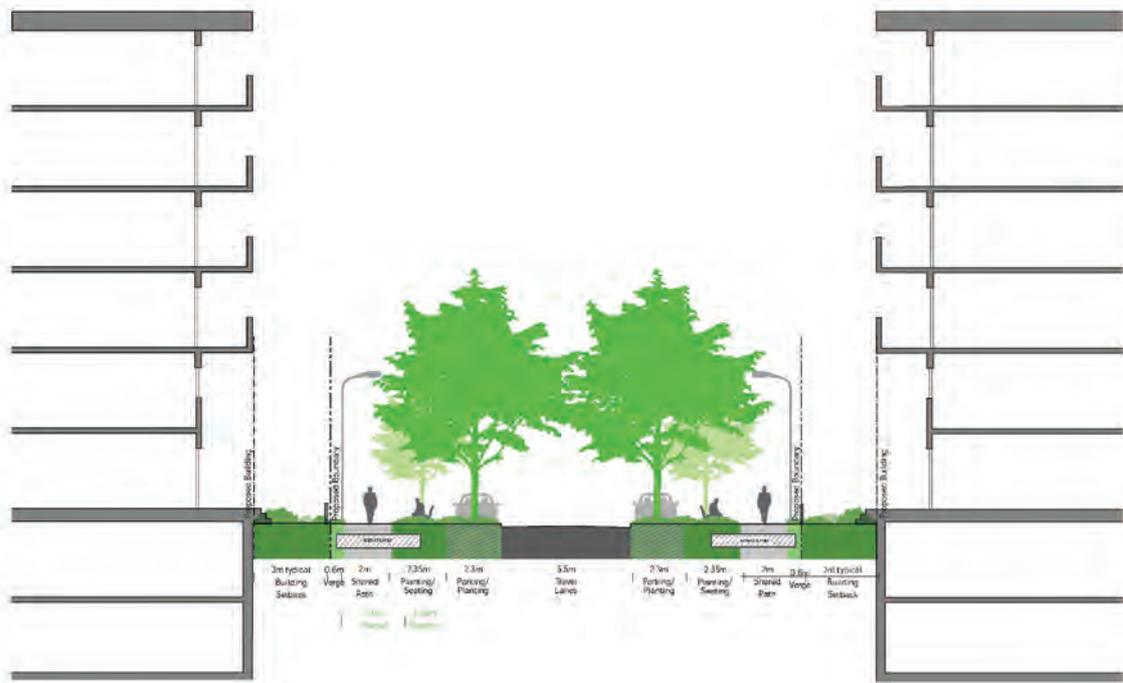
Indicative Street Section (Local Street without Bus Route 20m)
